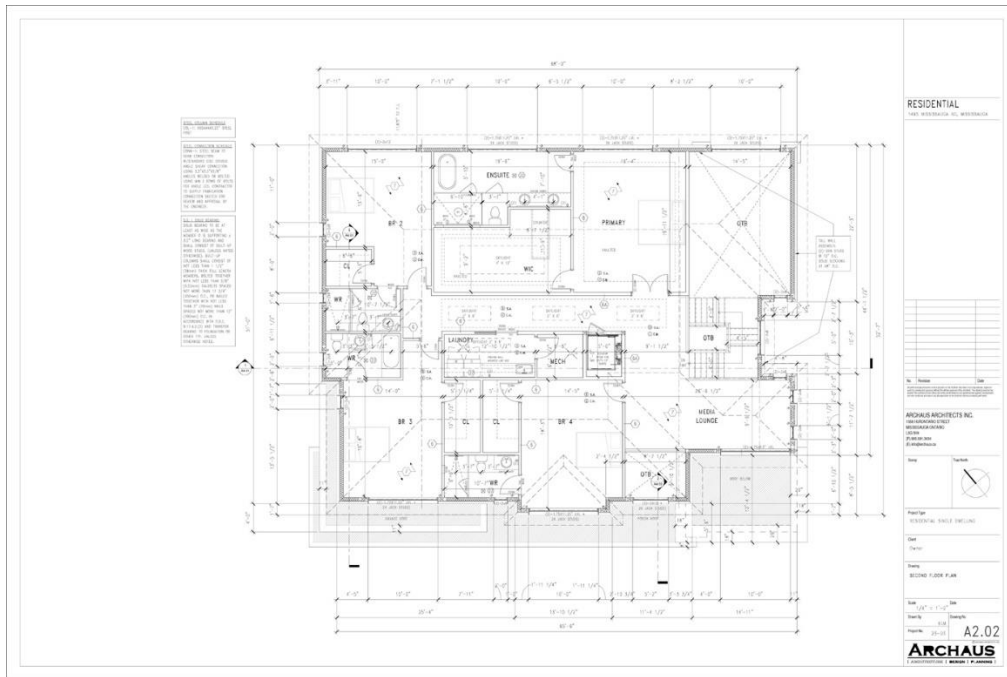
Second Floor Plan, Archaus, (APPENDIX III)
